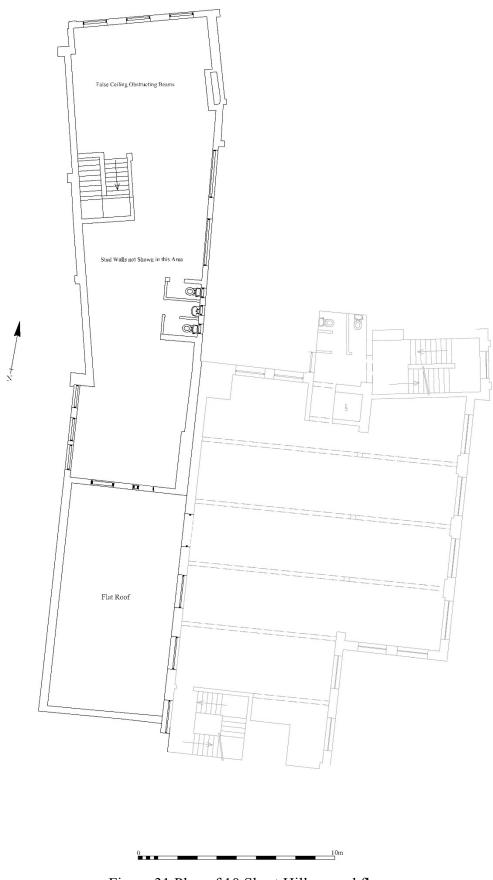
Plan of 10 Short Hill second floor Adjacent buildings not part of demolition shown in grey Modified from client's drawings
